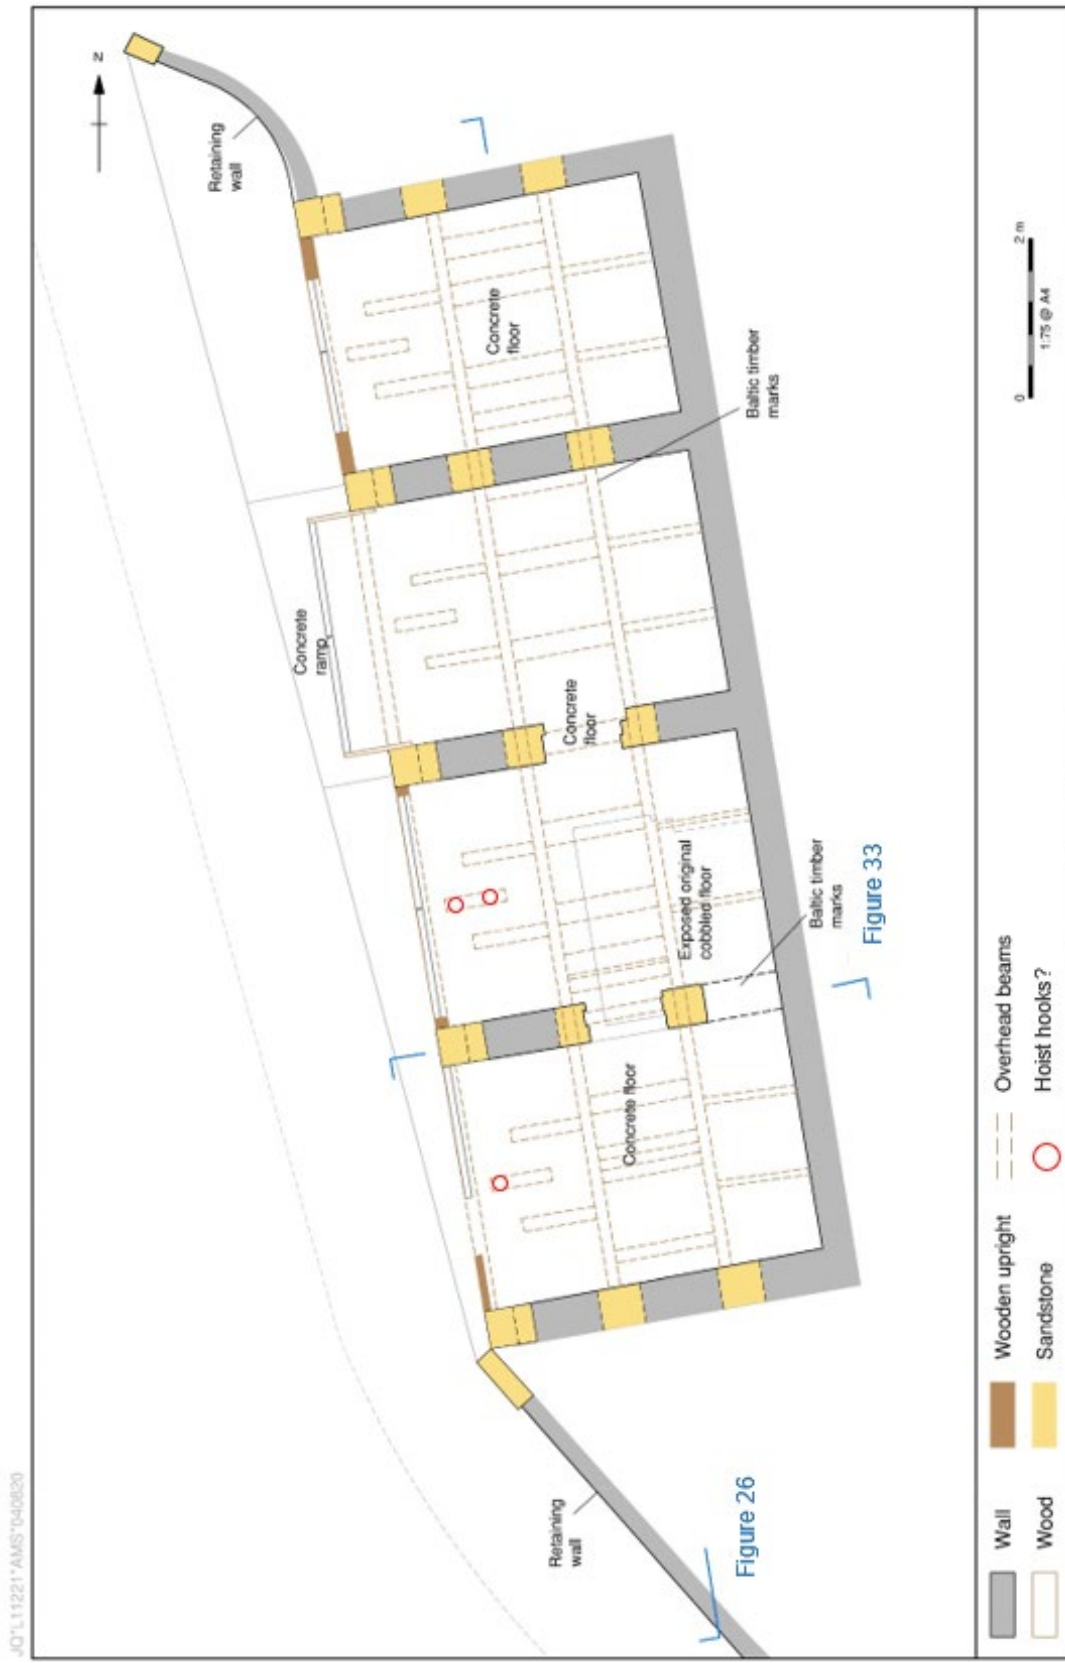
Ground floor plan (larger version of the plans can be seen in Appendix 1).
